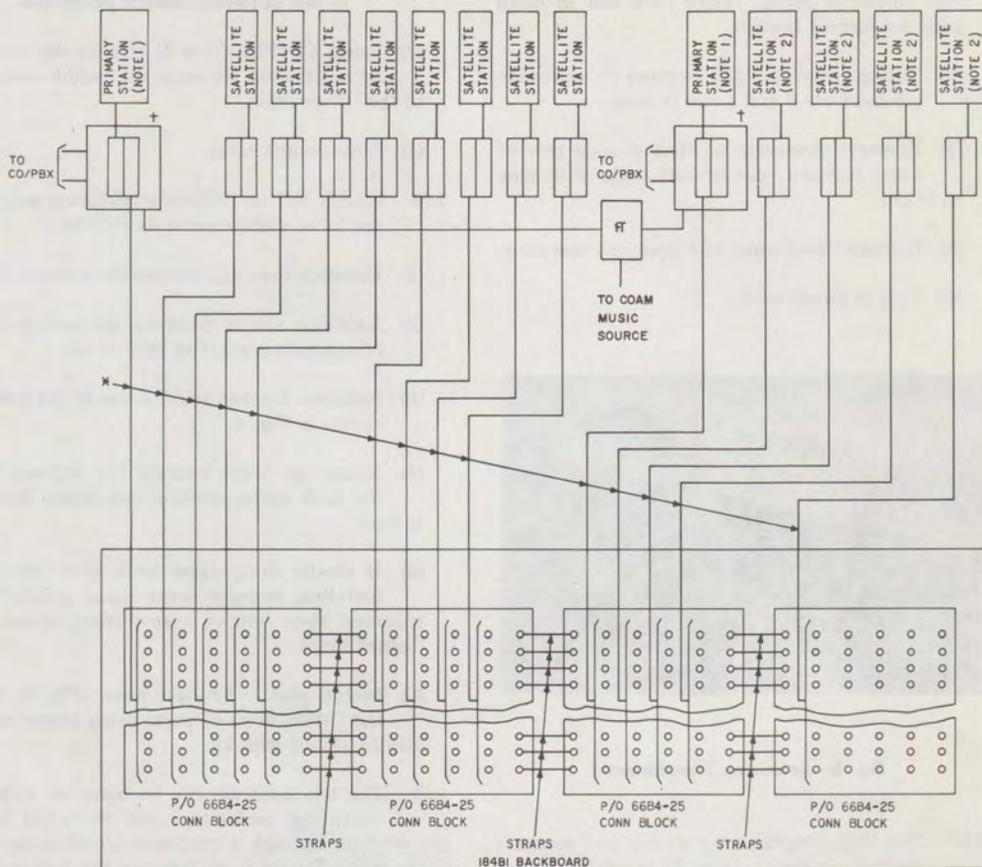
Typical Installation, Using Bridging Adapters and Connecting Blocks
